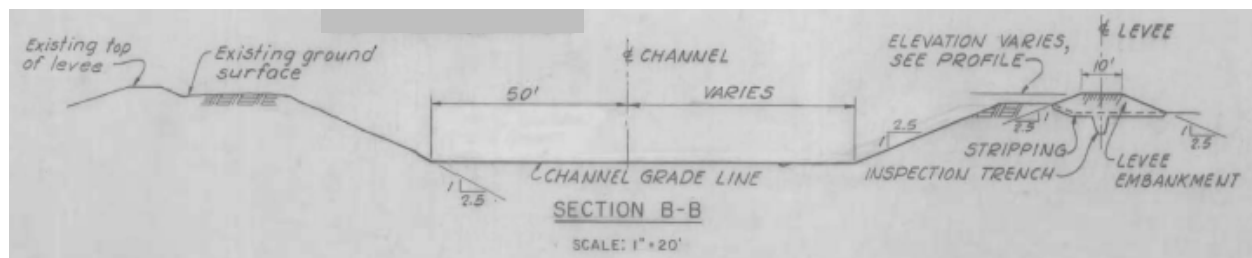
Channel Cross Section Station 850 Feet Upstream of Concrete Drop Structure
